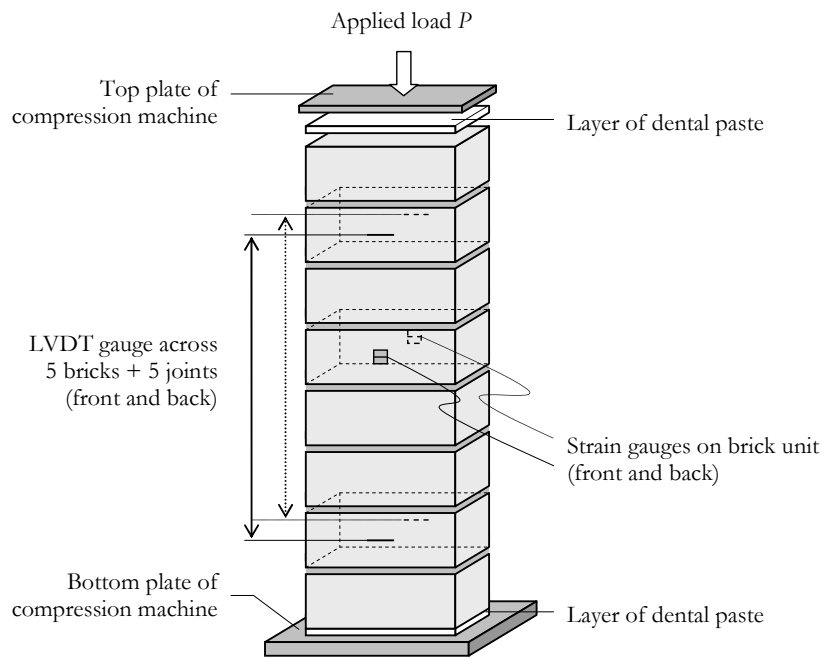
Compression test arrangement used for half-sized brick specimens.
